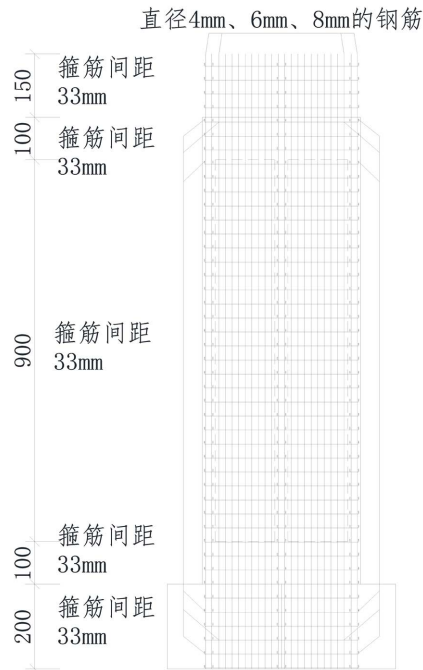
Reinforcement plan of 1/2 single pier with 6 mm and 8 mm rebars
